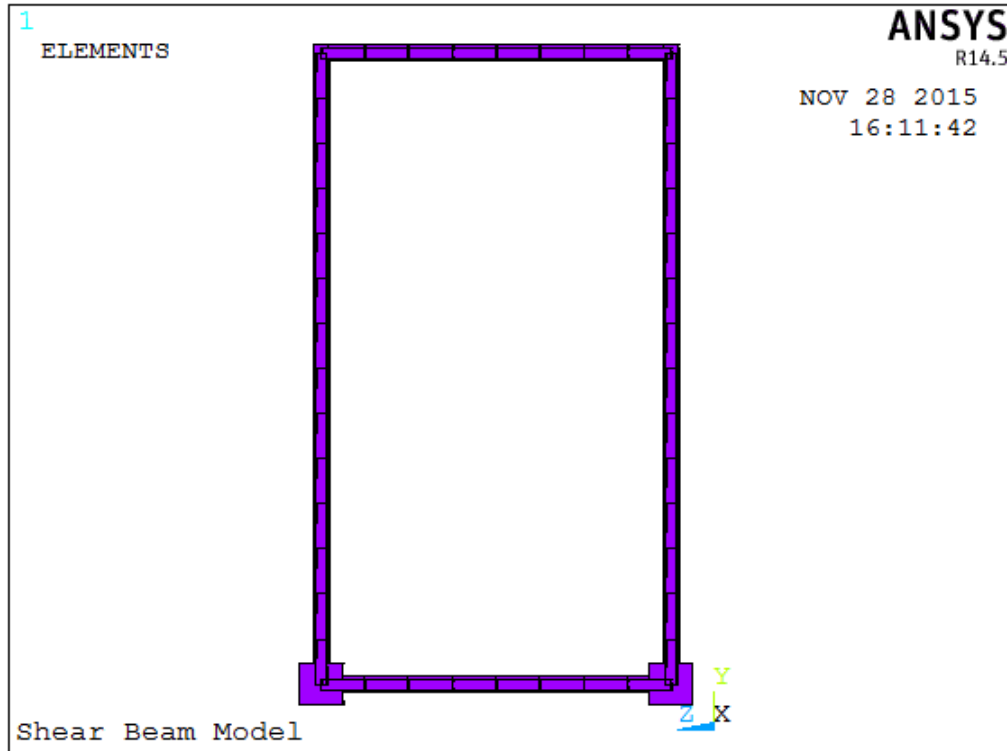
/b): Reinforcement Configuration– Shear Beam Model
